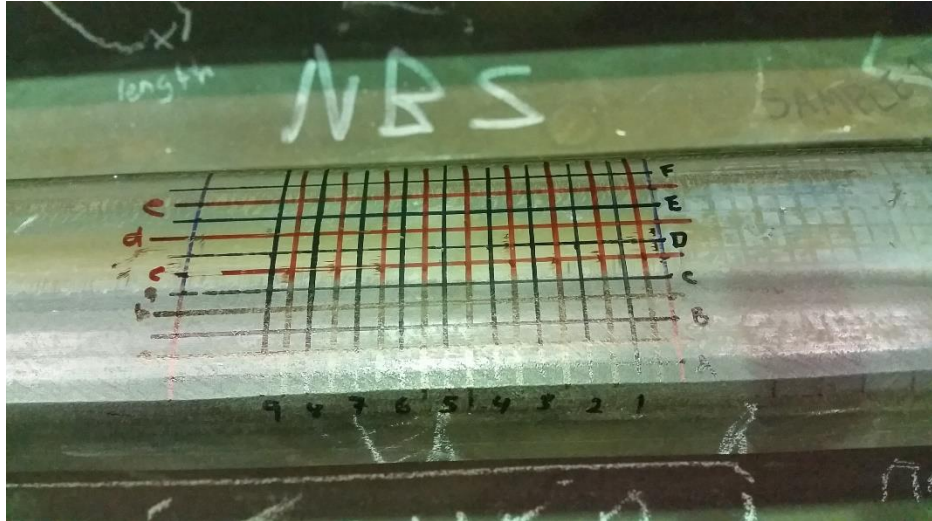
A 5x5mm grid drawn on the rail surface to map the location of subsurface defects
